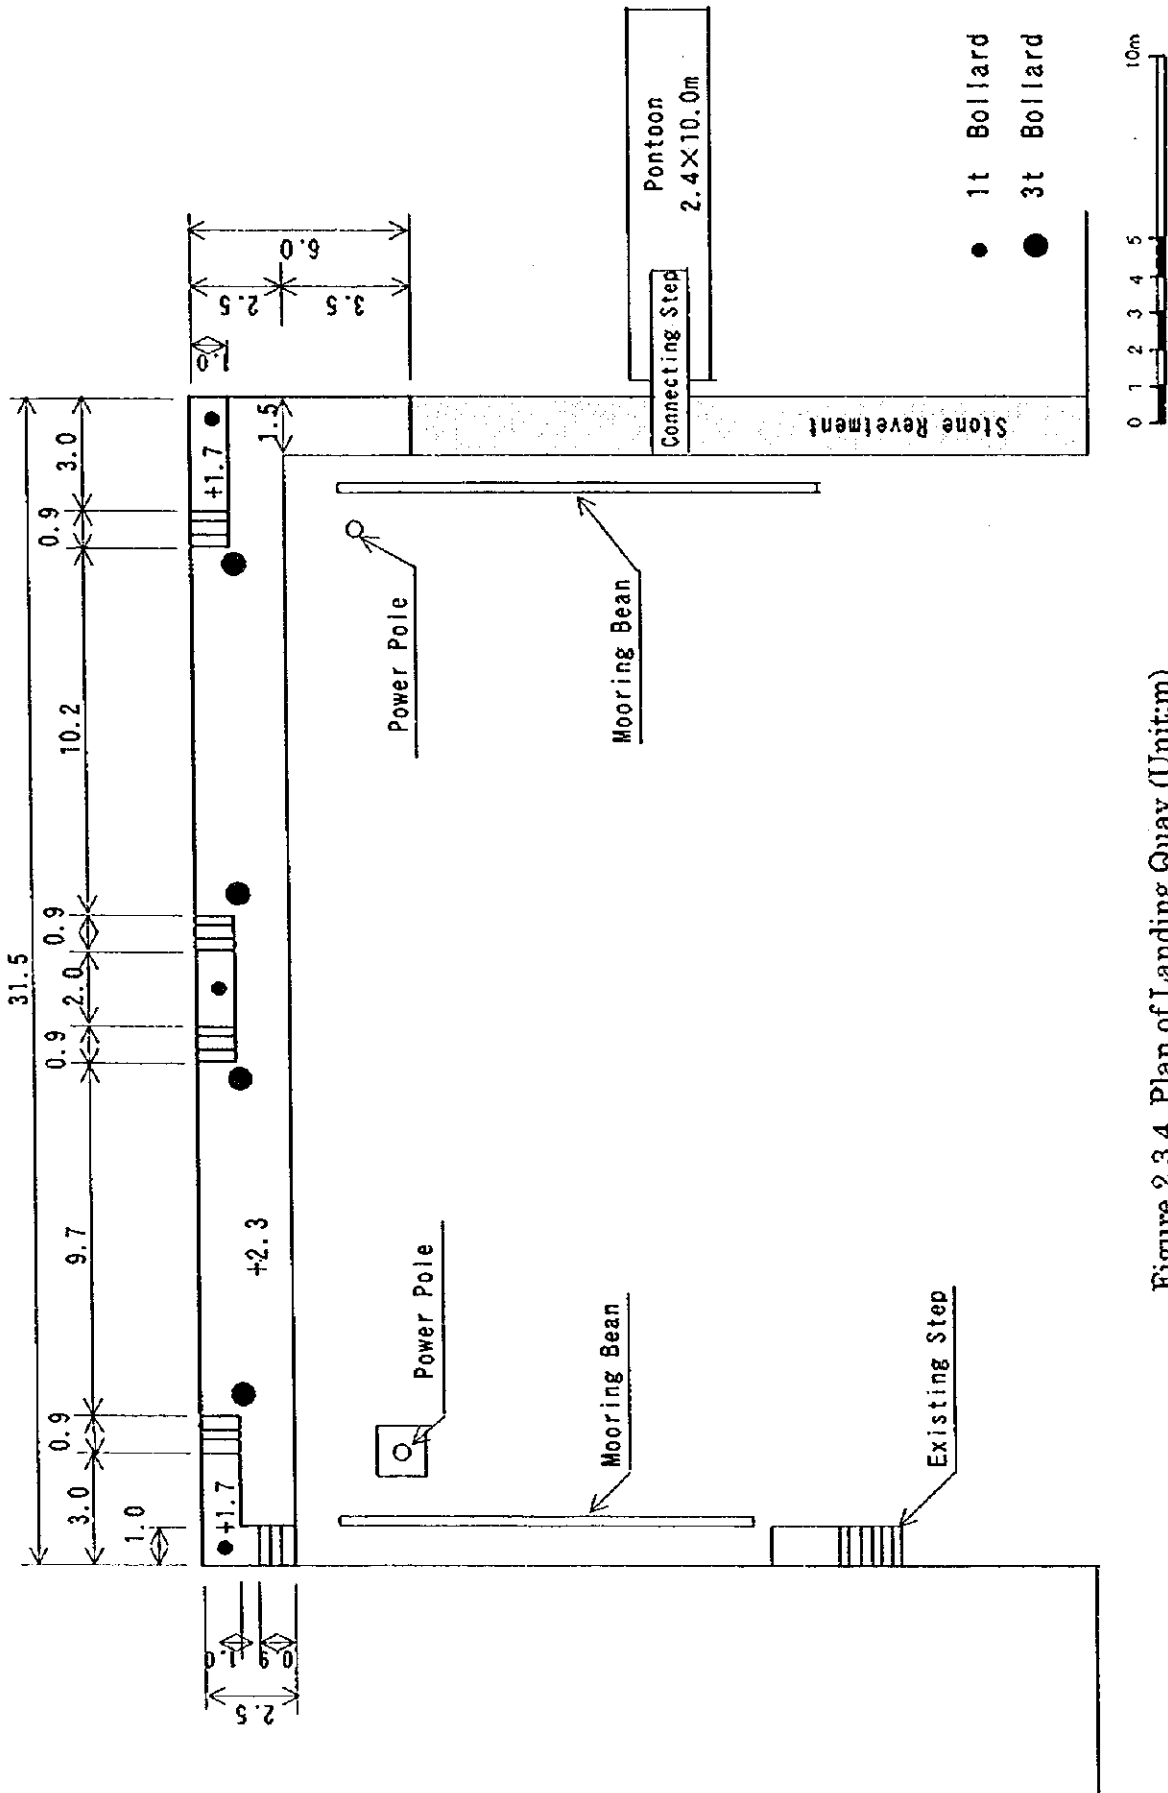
Plan of Landing Quay (Unit:m)
